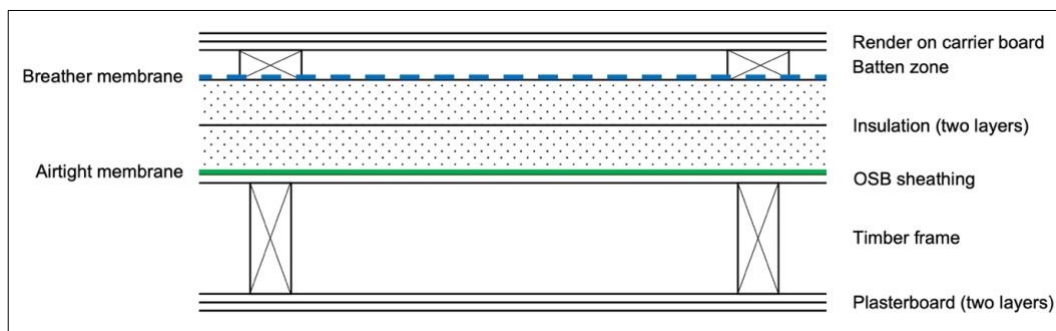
Timber frame construction with insulation located outside of the frame (PIR 1, PUR and PIR 2)
